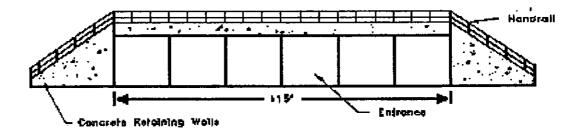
CH-TRU Waste Storage Facility, Building 7823.
